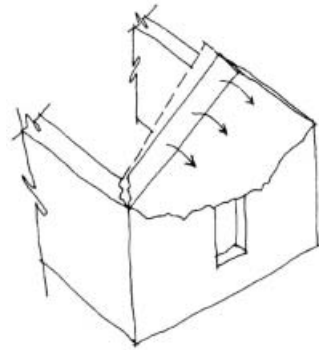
Diagram of the collapse of the upper portion of a gable-end wall.
